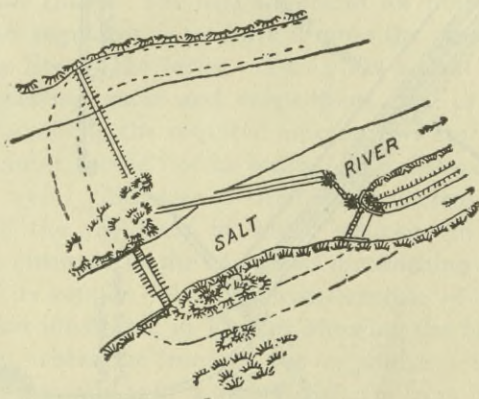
ARIZONA CANAL. PLAN OF HEADWORKS.
